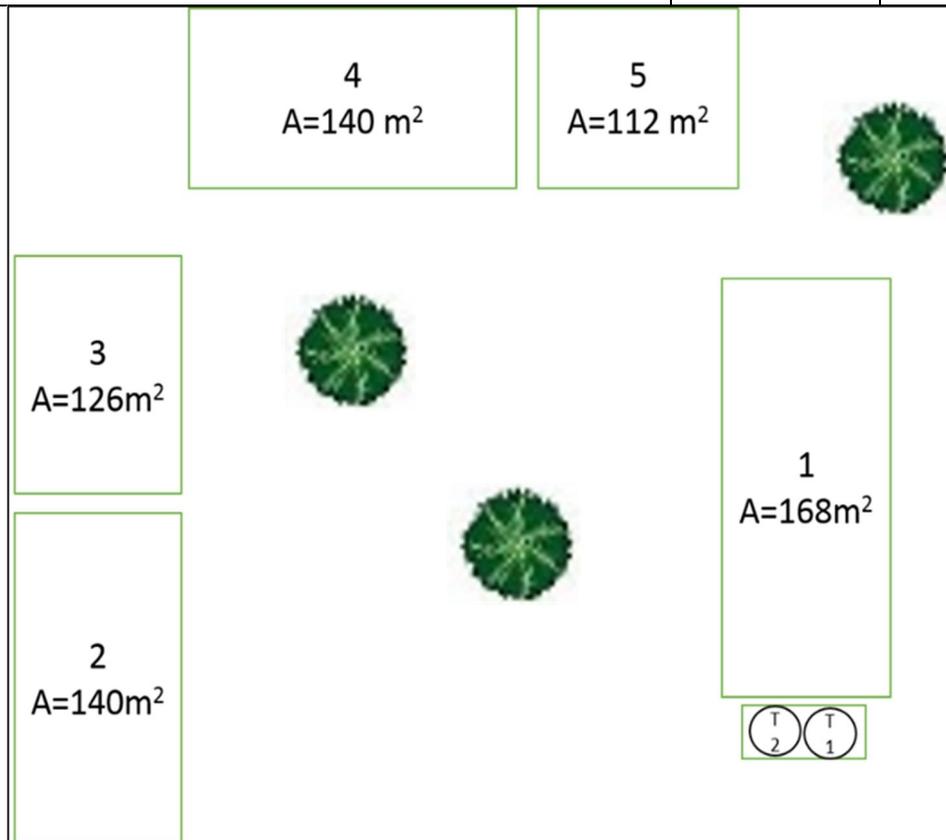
Layout plan sketch of Mnyundo Primary School in Mtwara Region
